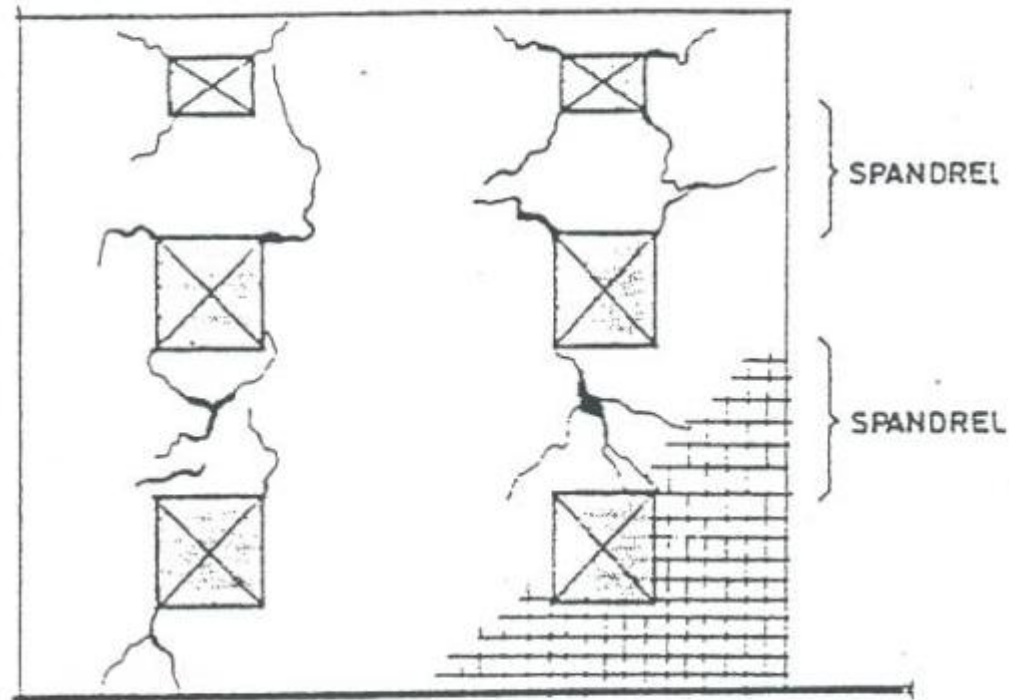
Cracking in Shear Wall at Corners of Opening
